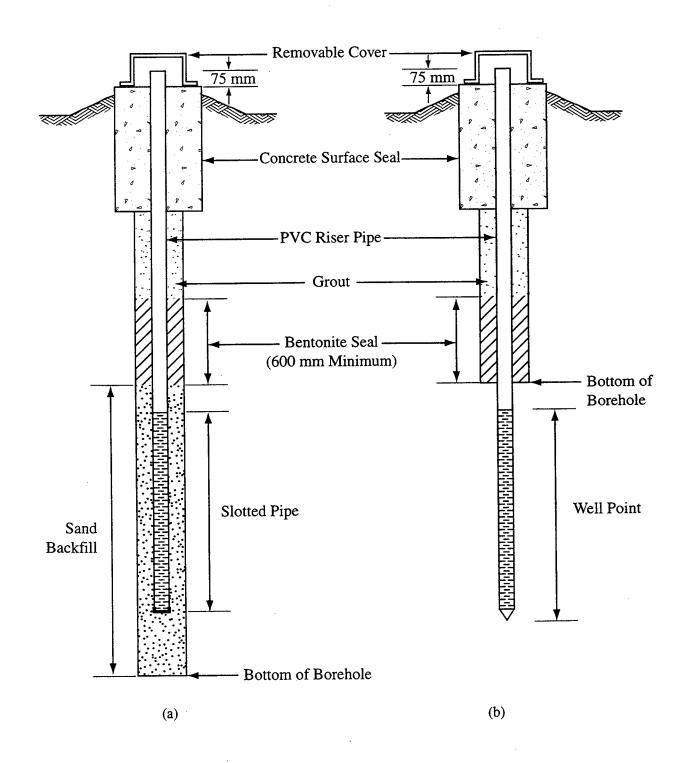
Typical Details of Observation Well Installations. (a) Stand-Pipe Piezometer, (b) Driven Well Point.
